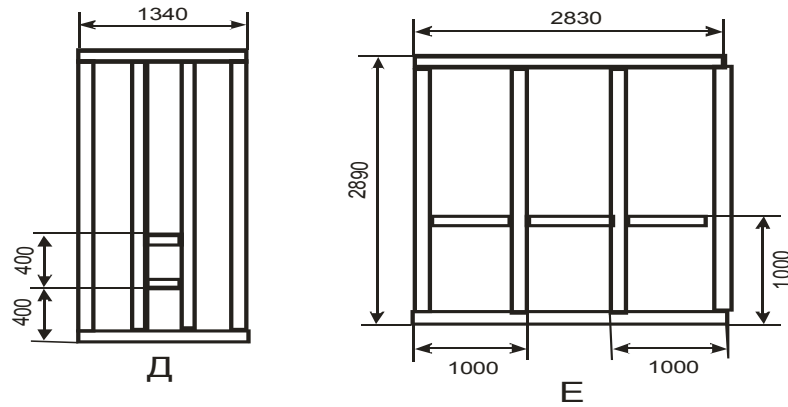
Sketches of frames for preparing of walls, ceiling and door of camera.
